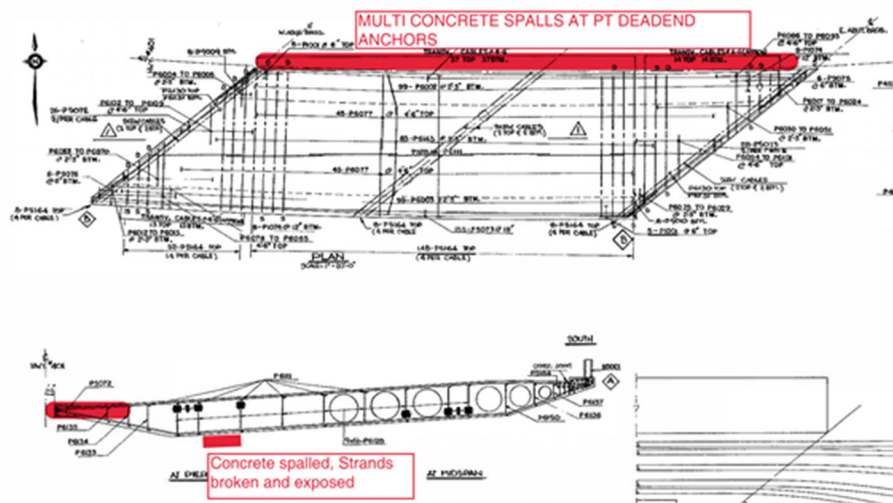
Dead End Anchor Corrosion, Strand Corrosion and Spalls at Lower Areas of the Soffit
